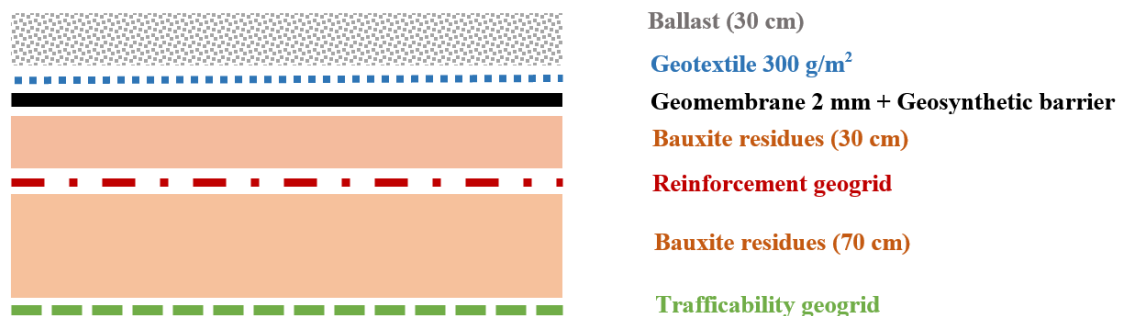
Detailed cross-section of the system implemented at the bottom of the pond.
